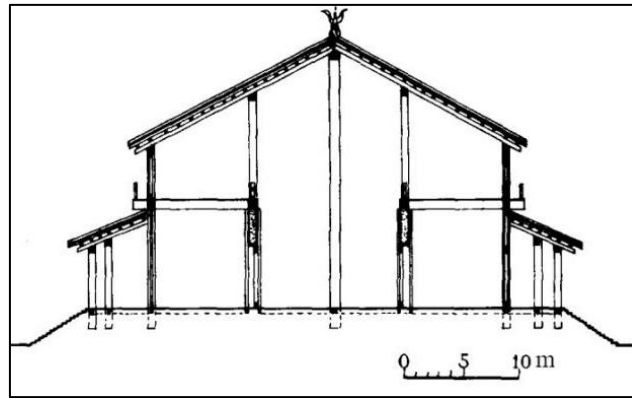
Side elevation of the Building Foundation No. 30 of Jinancheng<sup>357</sup>
